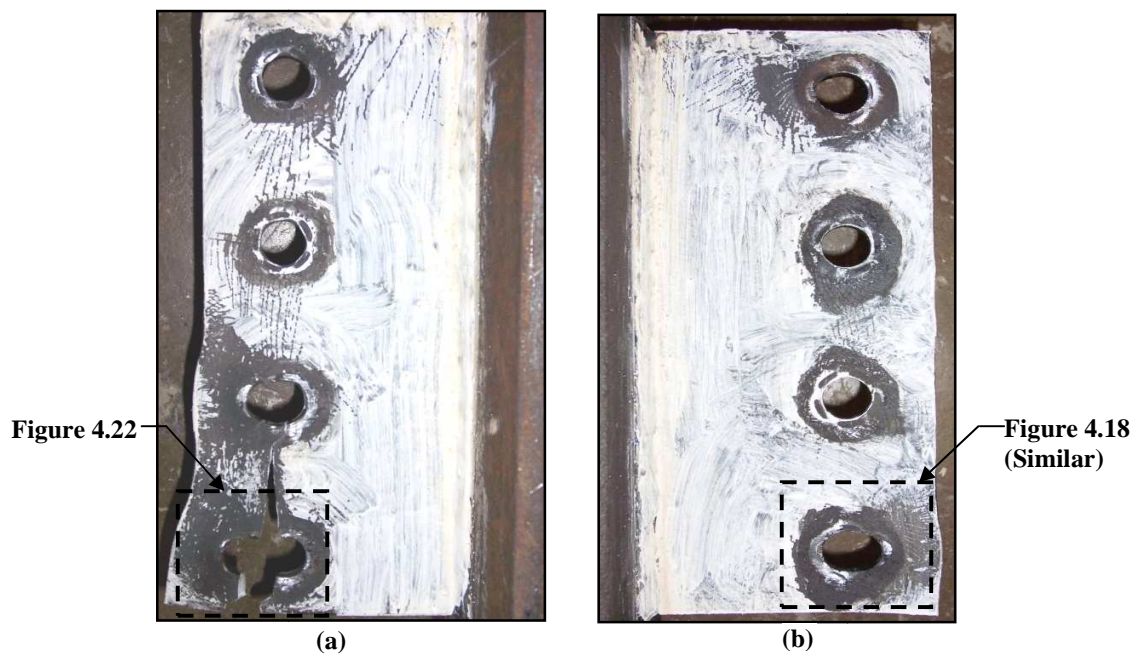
Test 4ST3 Connection Specimen Post-Test Condition.
